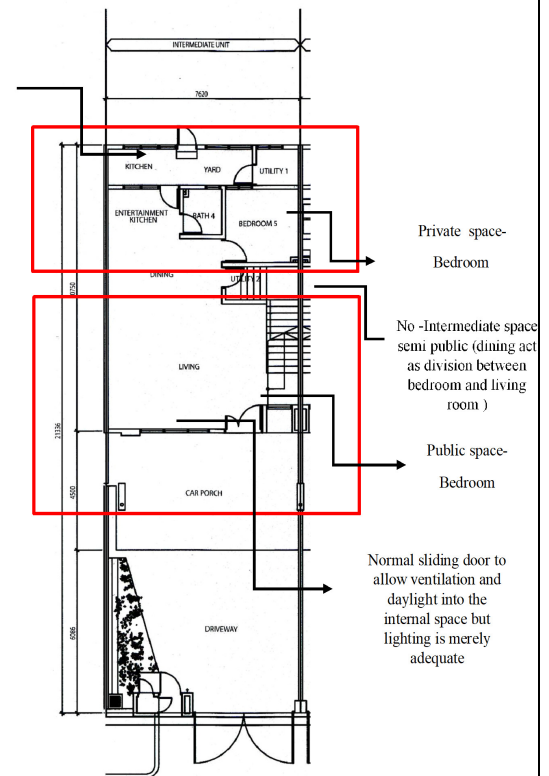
Ground Floor Plan of Terrace House, Licuala Garden Precinct
